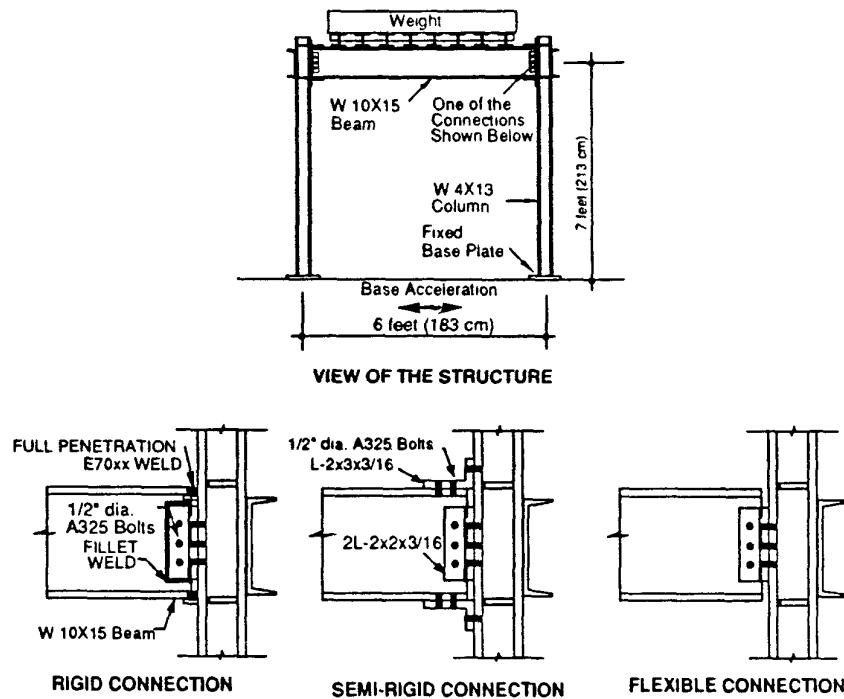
Shaking Table Test Frame and Three Types of Connections Used
